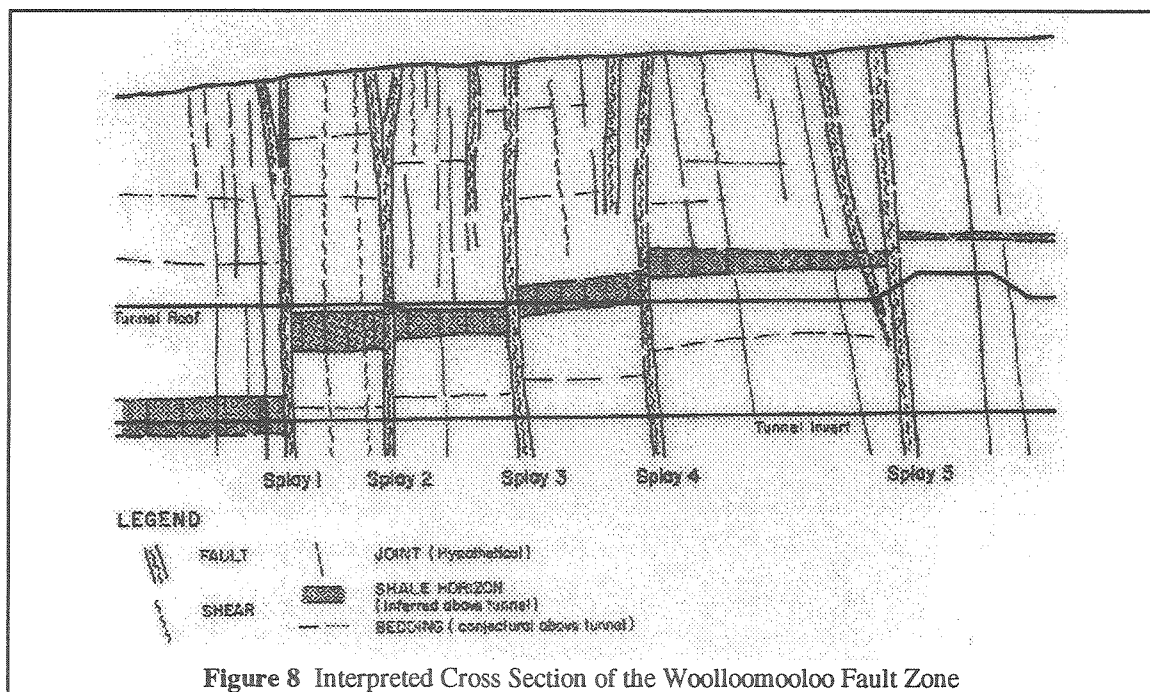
Interpreted Cross Section of the Woolloomooloo Fault Zone
